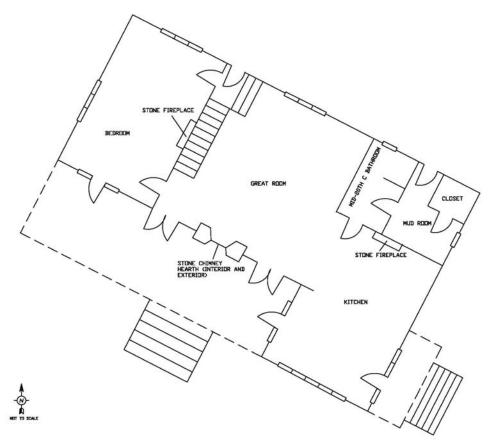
William Ellerson House, First Floor Drawn from photographs provided by NC HPO western office
